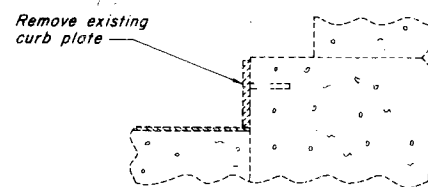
DETAIL OF TRANSVERSE JT. NEAR BT. NO. 4
